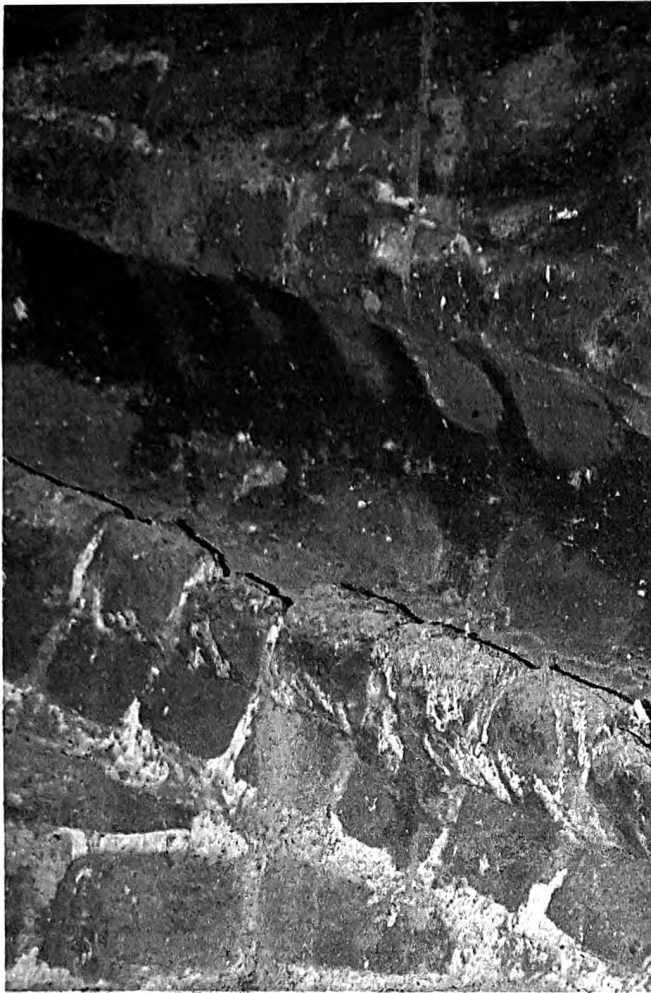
Eastbury Manor House, Barking, East London, c.1556. The handhold to the higher status timber stair. (M.Tutton)
